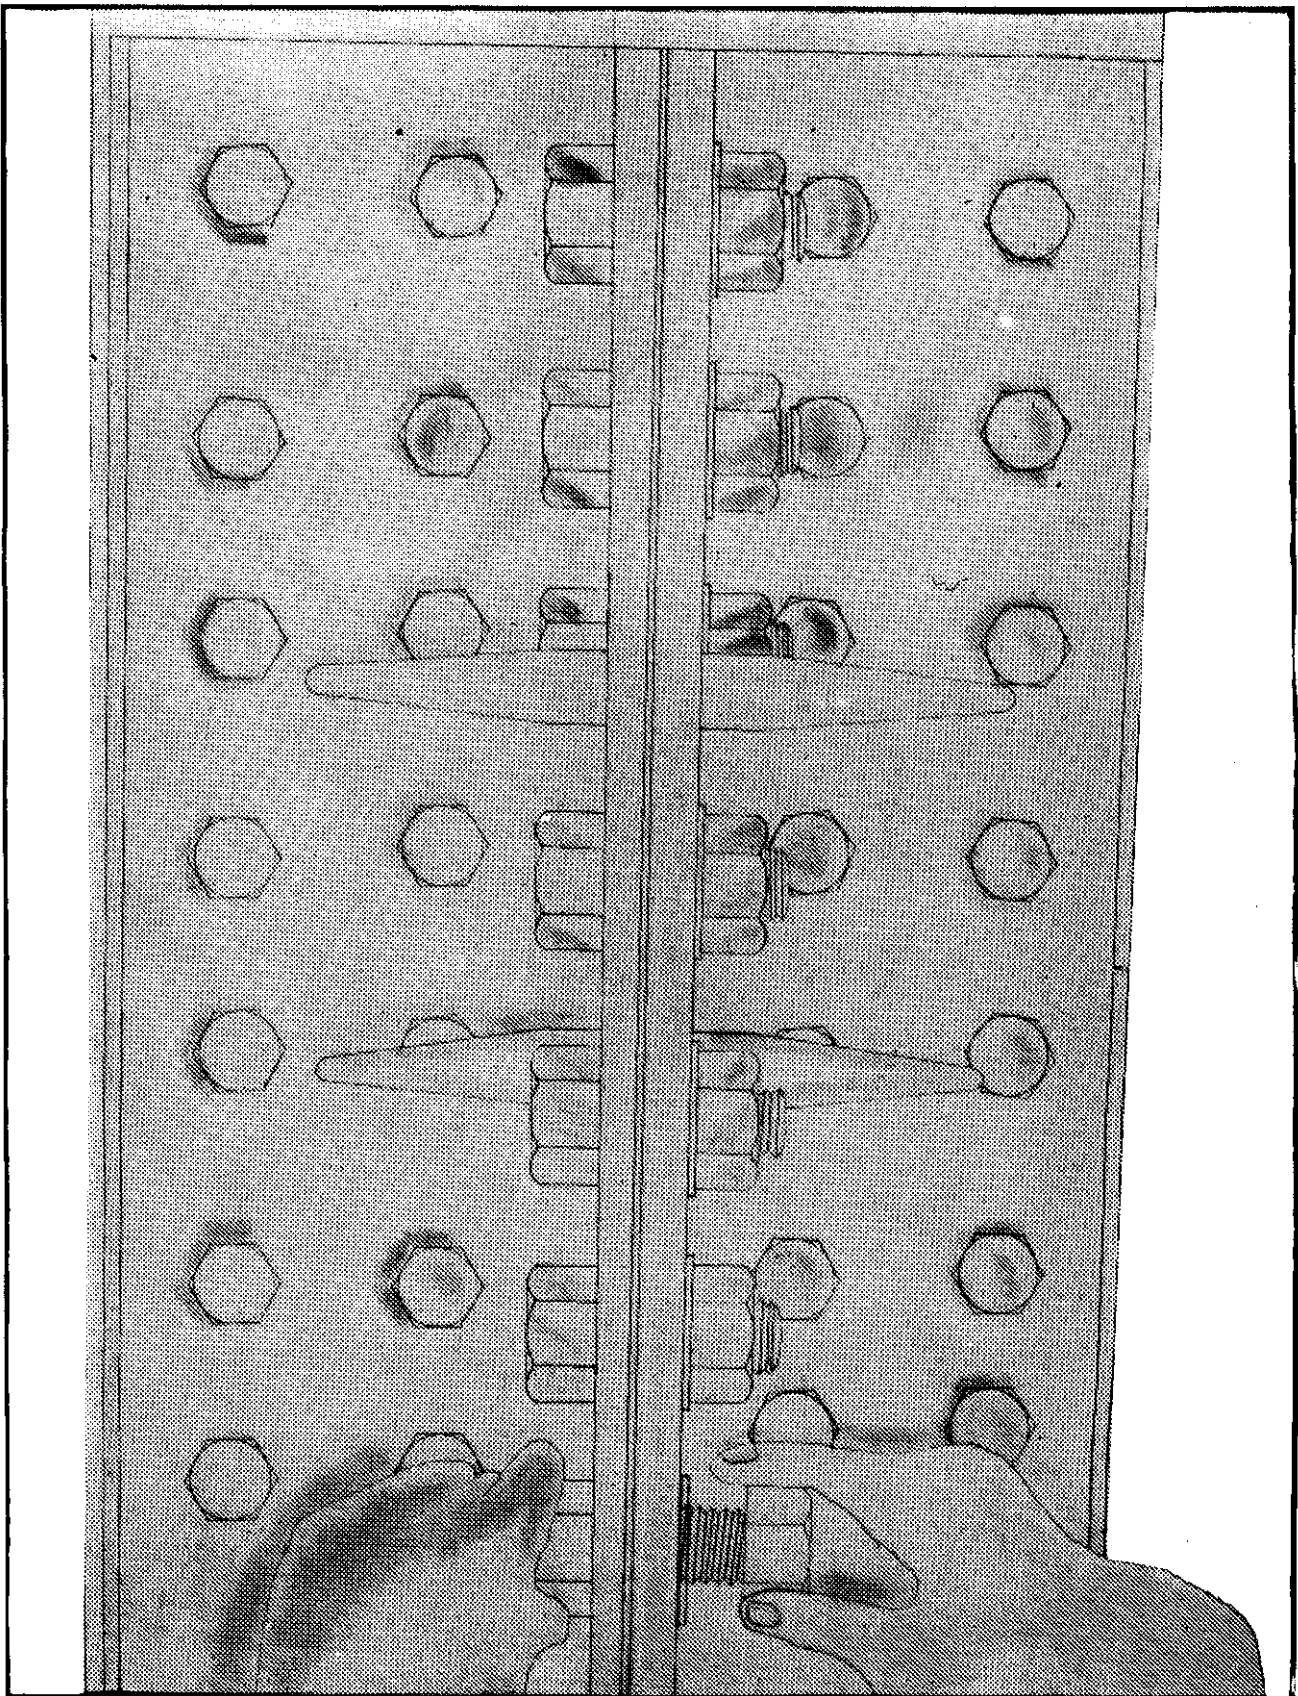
BOLTS ASSEMBLED WITH NUTS & WASHERS
